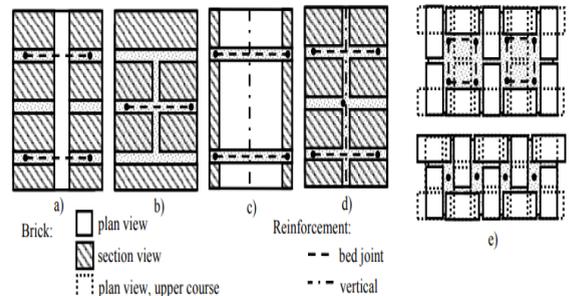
a) Reinforced cavity wall, b) Reinforced solid masonry, c) Reinforced hollow unit masonry, d) Reinforced grouted masonry, e) Reinforced pocket type wall.
